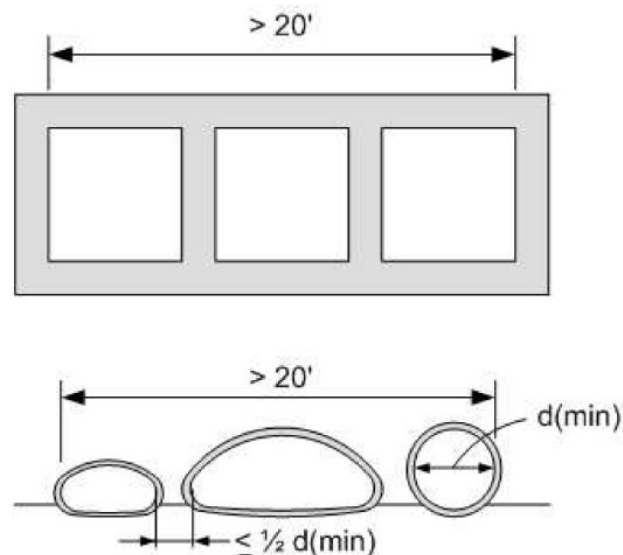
Culverts Meeting Definition of Bridge Length in the NBIS
